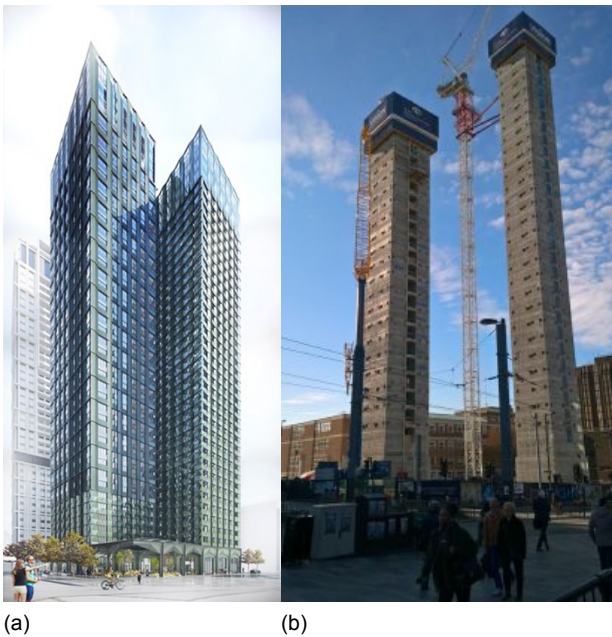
101 George Street, Croydon (2.12a) and its concrete cores (2.12b) [26][41]
